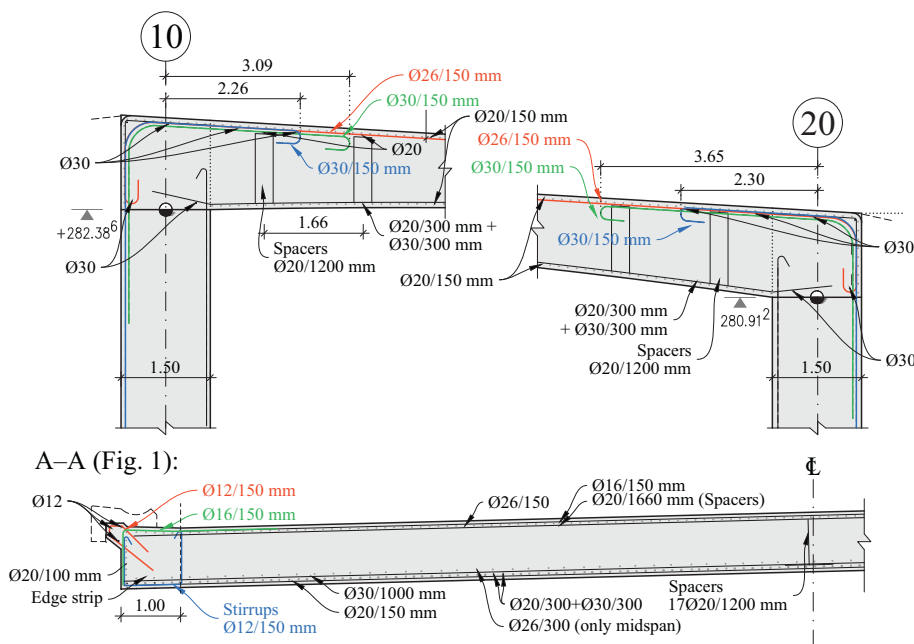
Layout of deck slab reinforcement at the abutments and in cross section at midspan.
